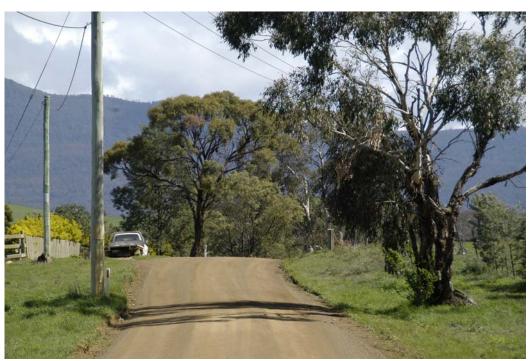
the left hand side of this photo is the house nearest to the road along the cartage route. Some reshaping of the corner and widening would be necessary in this section. Photo was taken looking west.
